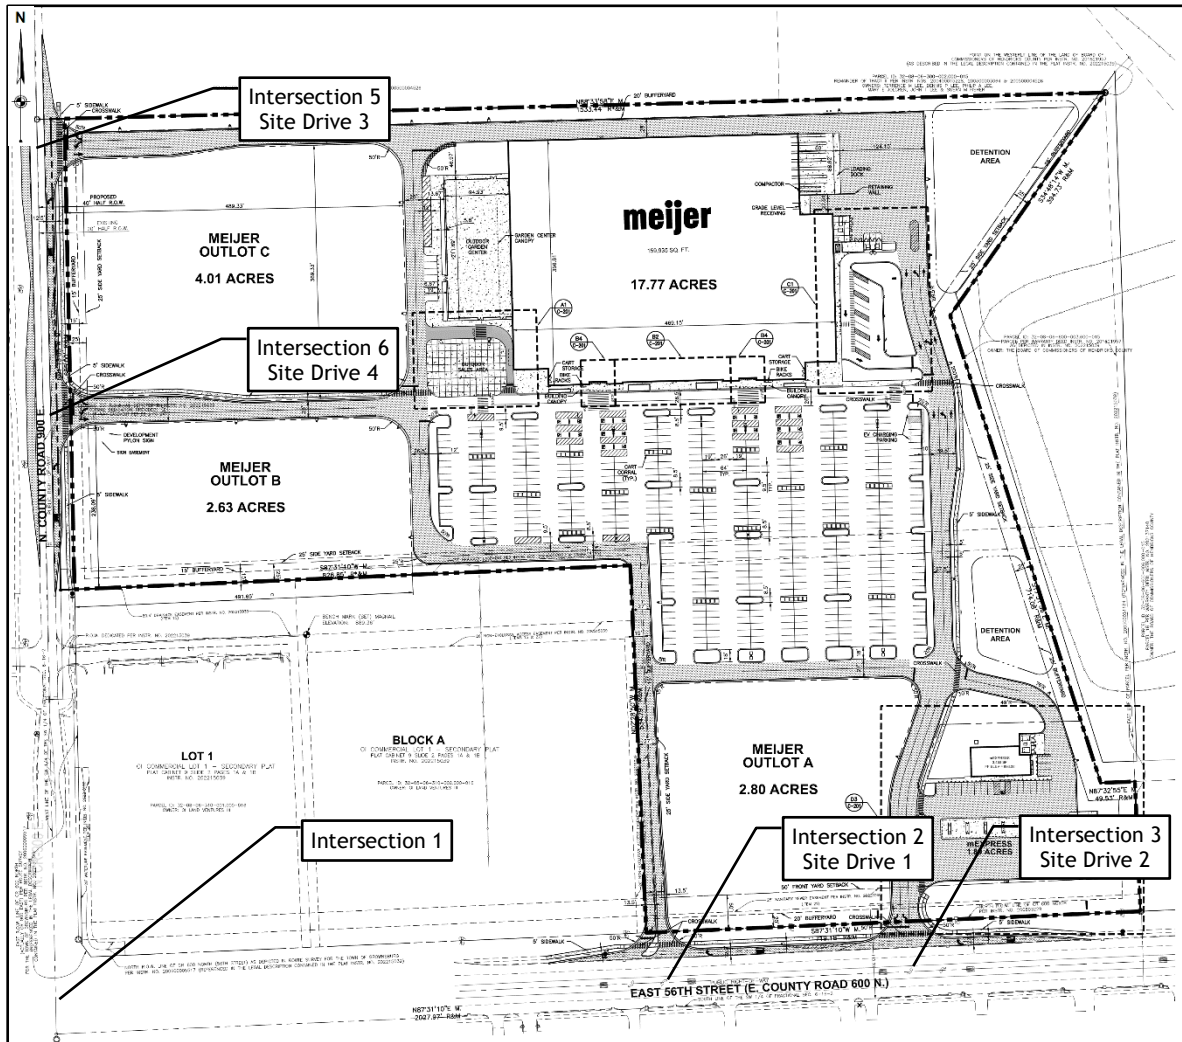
Proposed Preliminary Meijer Development Site Plan. N.T.S.
